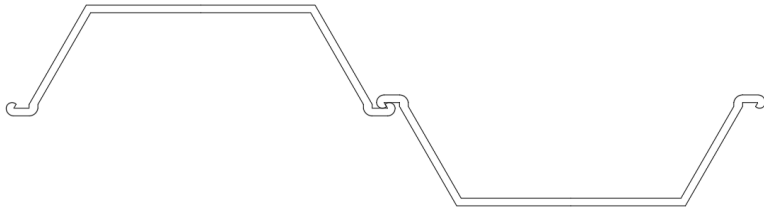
Cross-section of a U-profiled sheet pile wall element.
